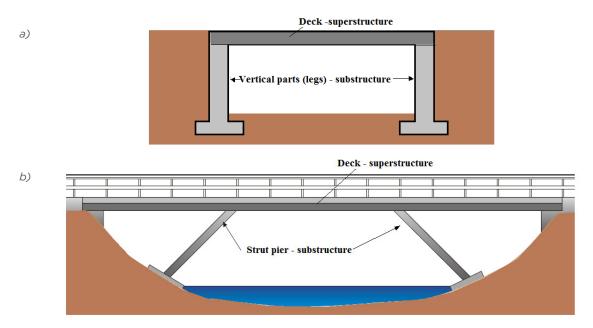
Definition of super- and substructure for frame bridges a) Portal frame; b) Strut frame
